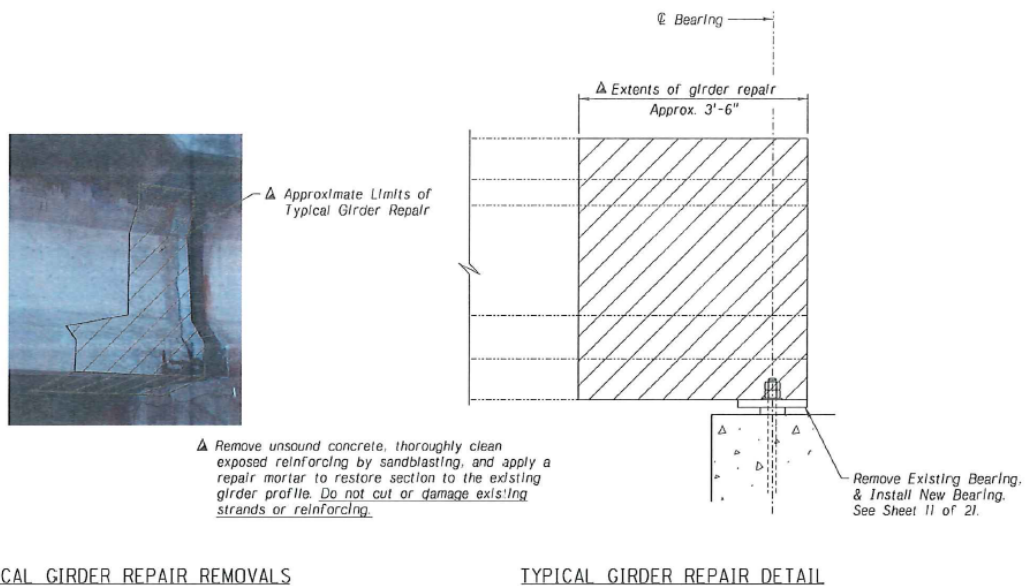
Removing loose materials and cleaning exposed reinforcement at girder end, from the repair documents of Platte River Bridge East of Grand Island, courtesy of NDOT
